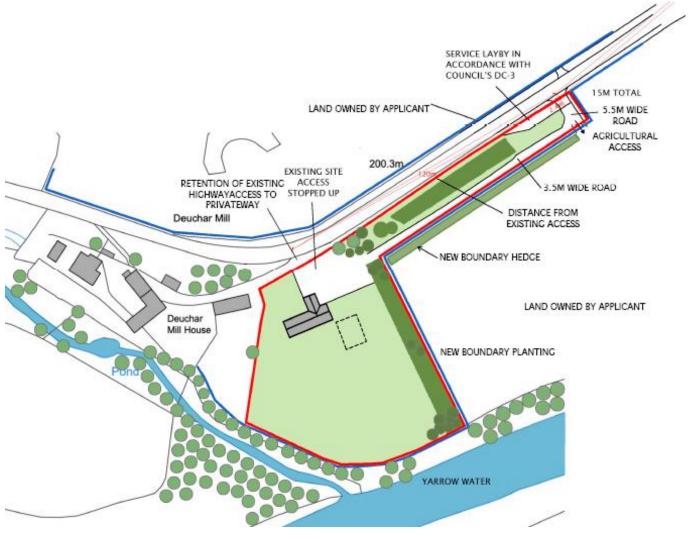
Proposed site layout from 10059-0-02(B) Site Plan – as Proposed (Source: Camerons Strachan Yuill Architects).
